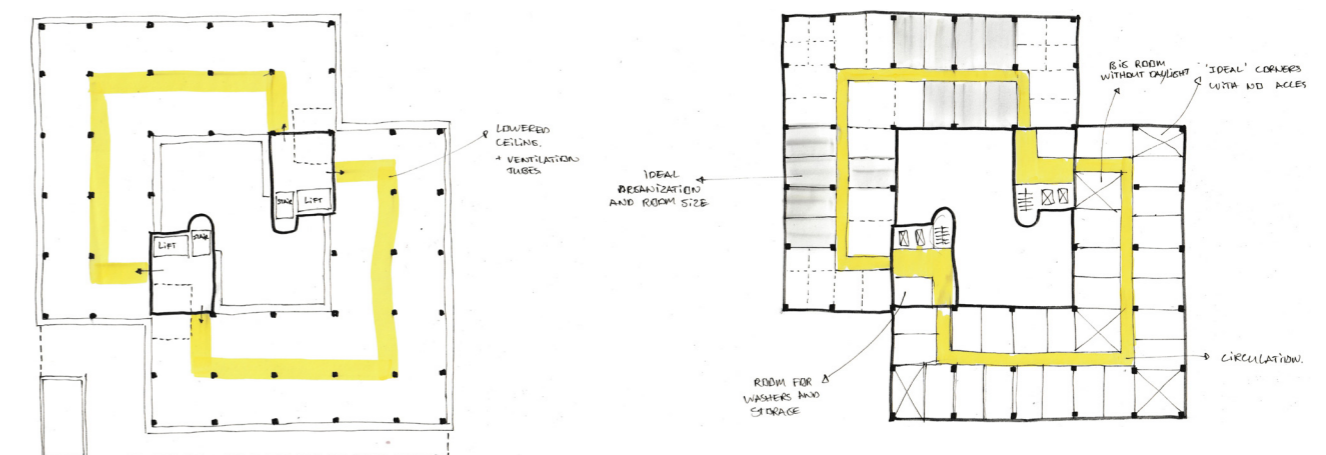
Reuse of lowered ceiling and adjacent layout concept (Lars Haga, 2026)
